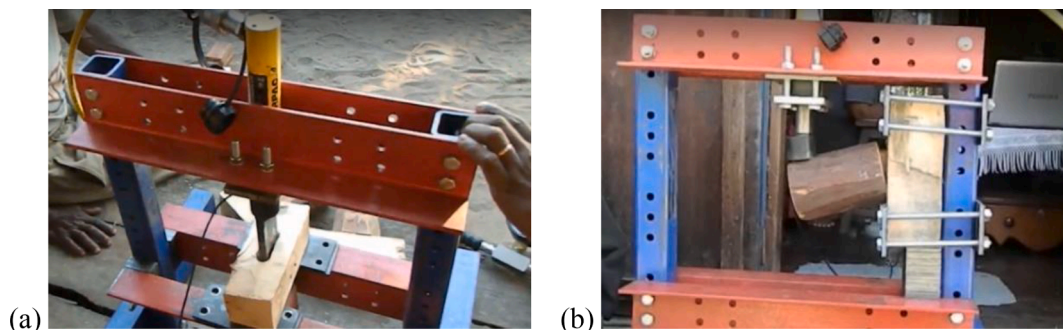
Experimental setup for (a) pushout test and (b) bending test of MT joints.
